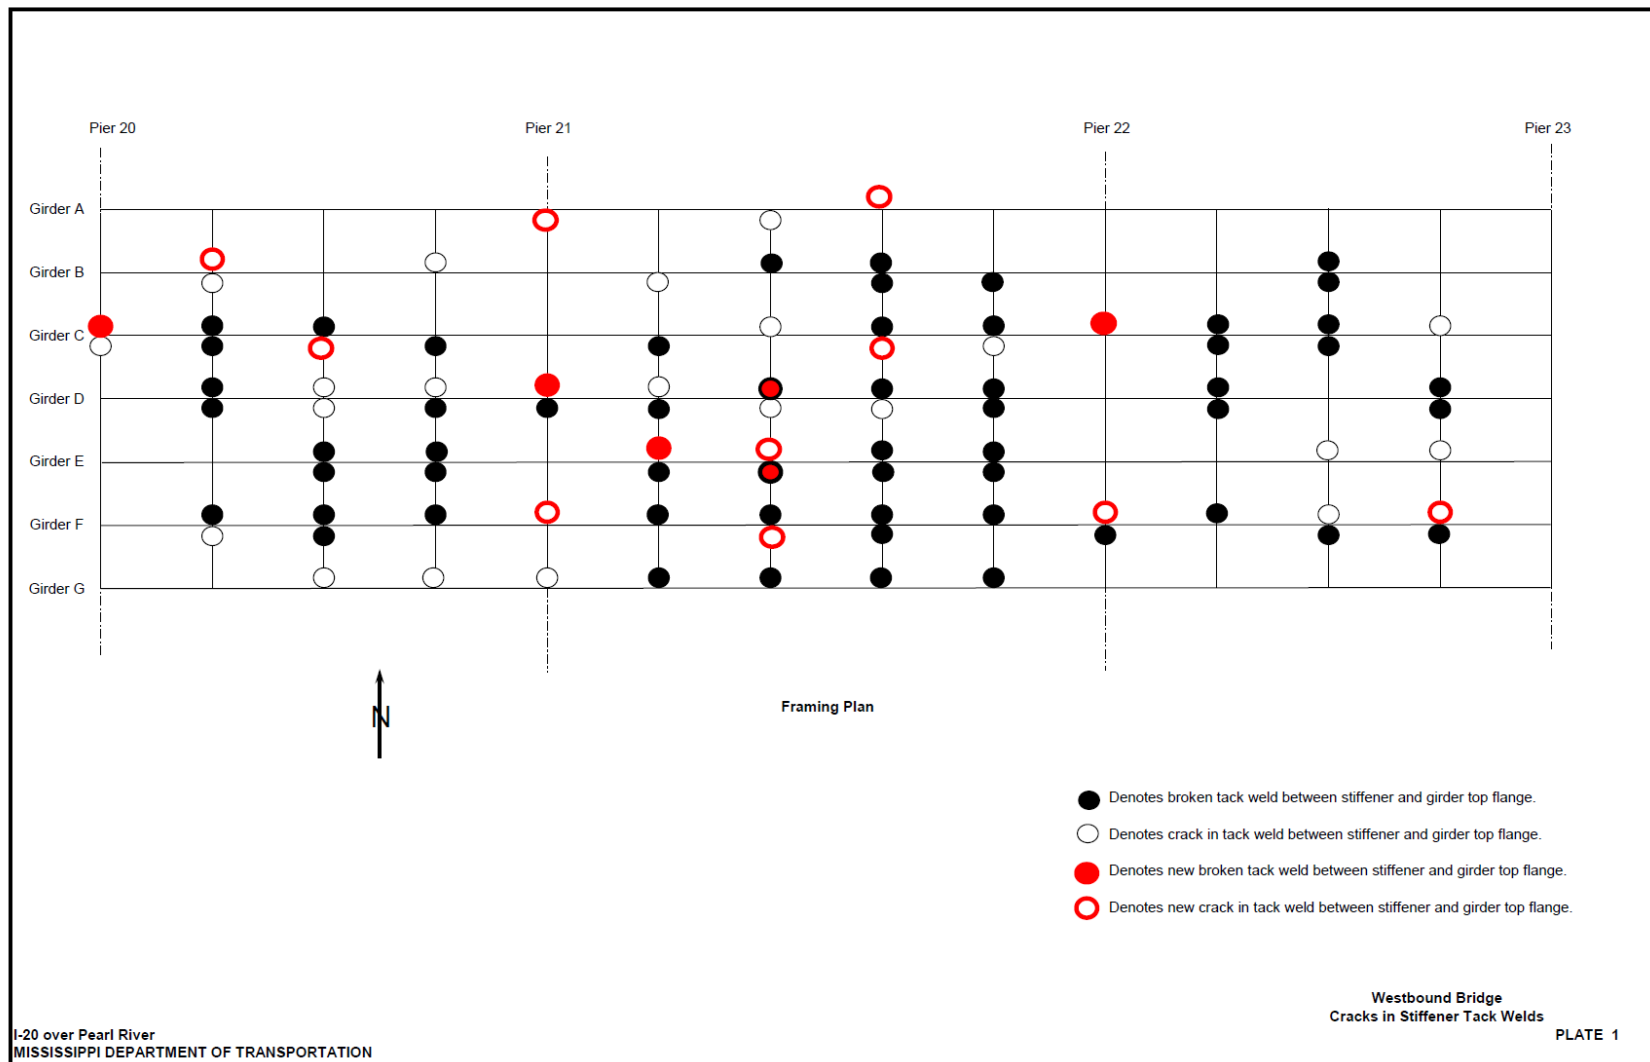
Westbound Bridge Cracks in Stiffener Tack Welds
